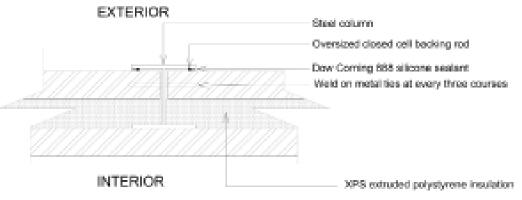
Wall Plan Detail (not to scale) (Author, 2019).
